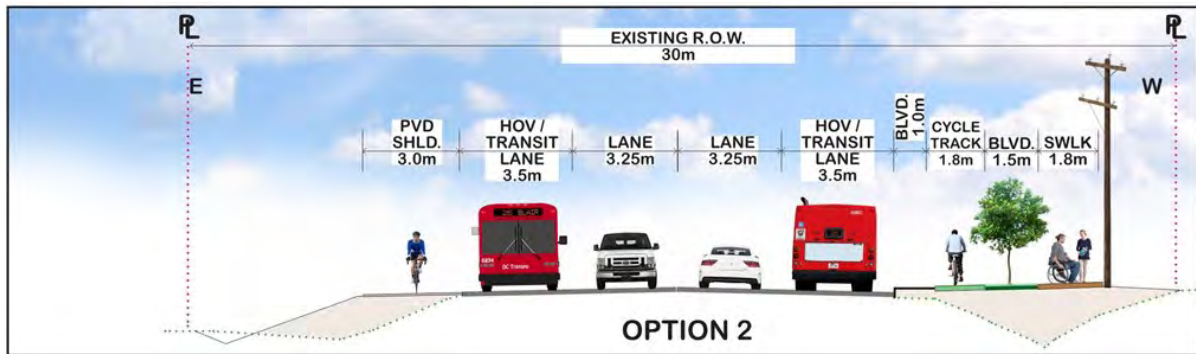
Option 2 - West Cycle Track and Sidewalk/East Paved Shoulder
